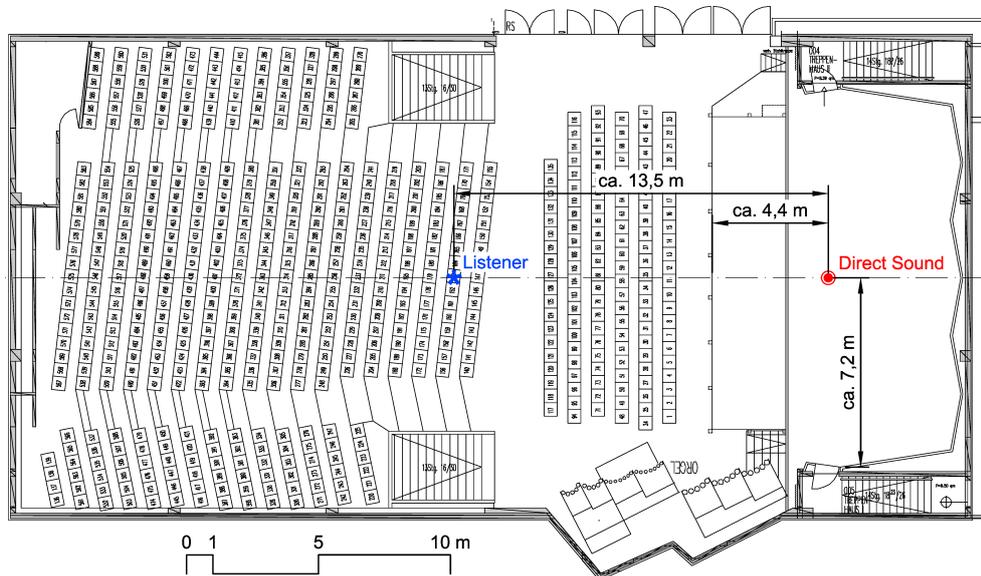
Plan of the Konzerthaus Detmold with a typical test arrangement.
